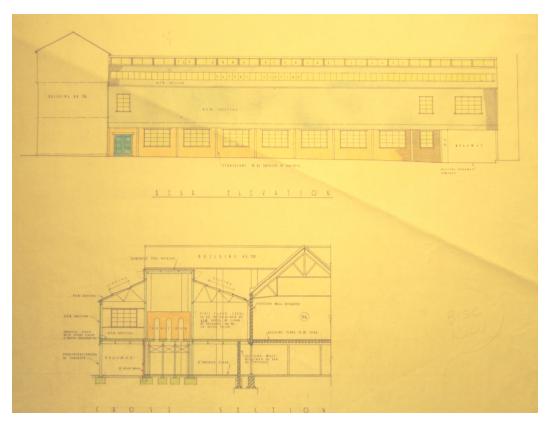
Elevations of Building T as planned in March 1947. The top shows the south elevation and the bottom the east with the kiln set on the first floor. Building S (right) still has its gable roof and truss (source: Worcester Porcelain Museum).
